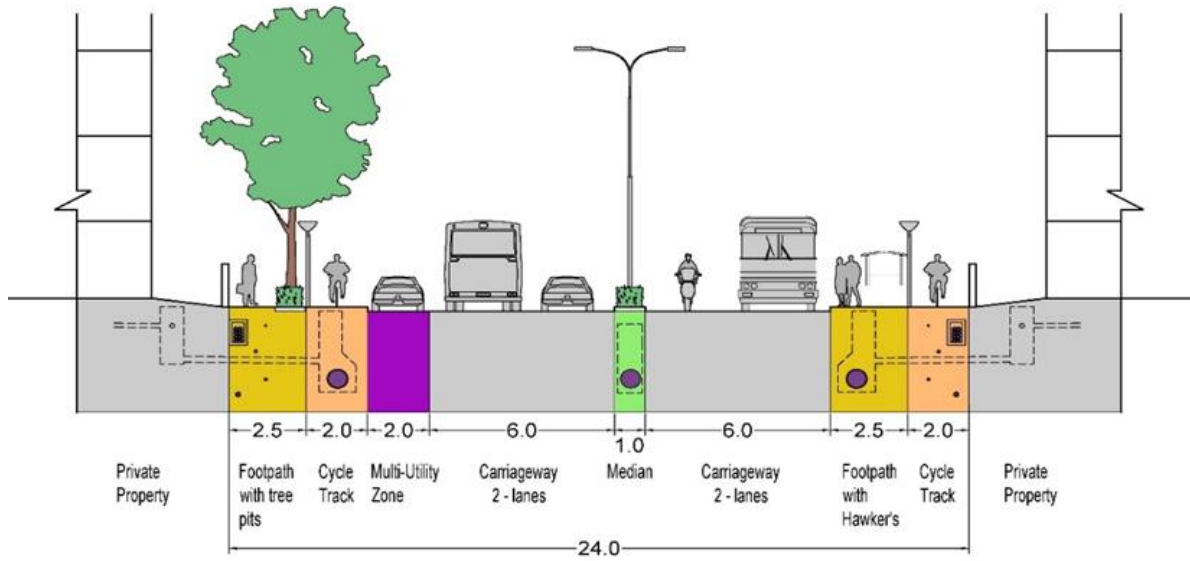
TYPICAL SECTION OF 24M WIDE ROAD
